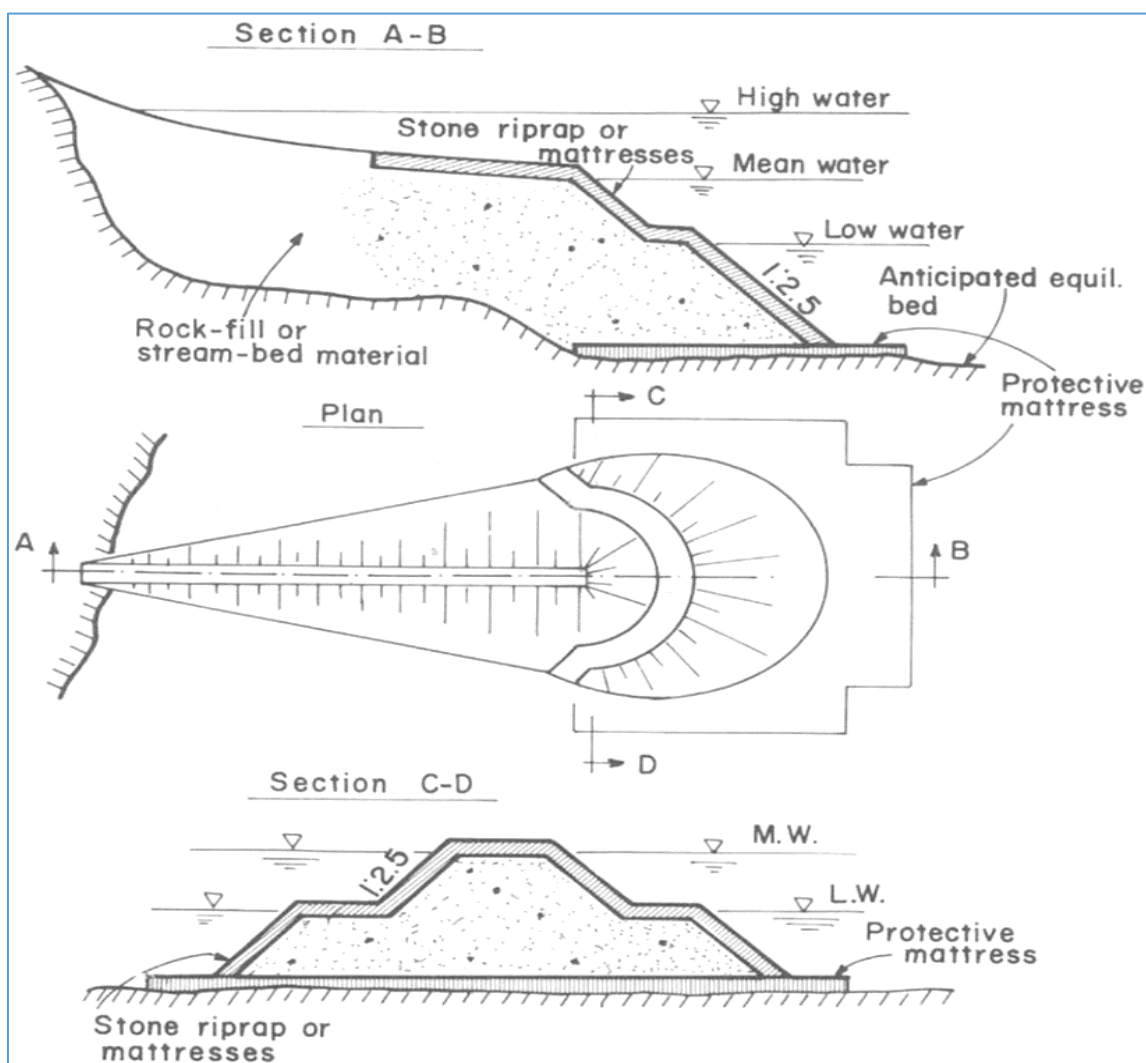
Typical Plan and Cross Sections of Groynes along River Bank
